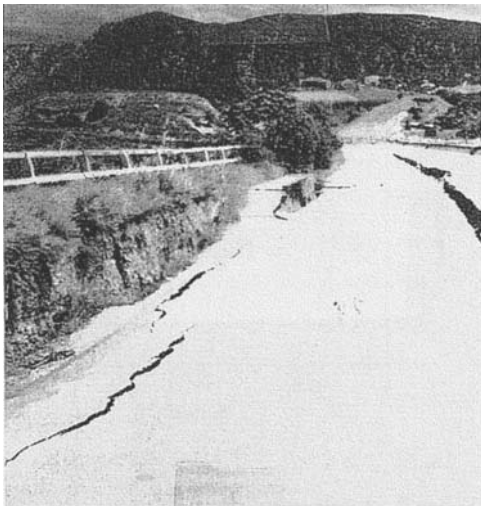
Soil and pavement cracks at the embankment crest
